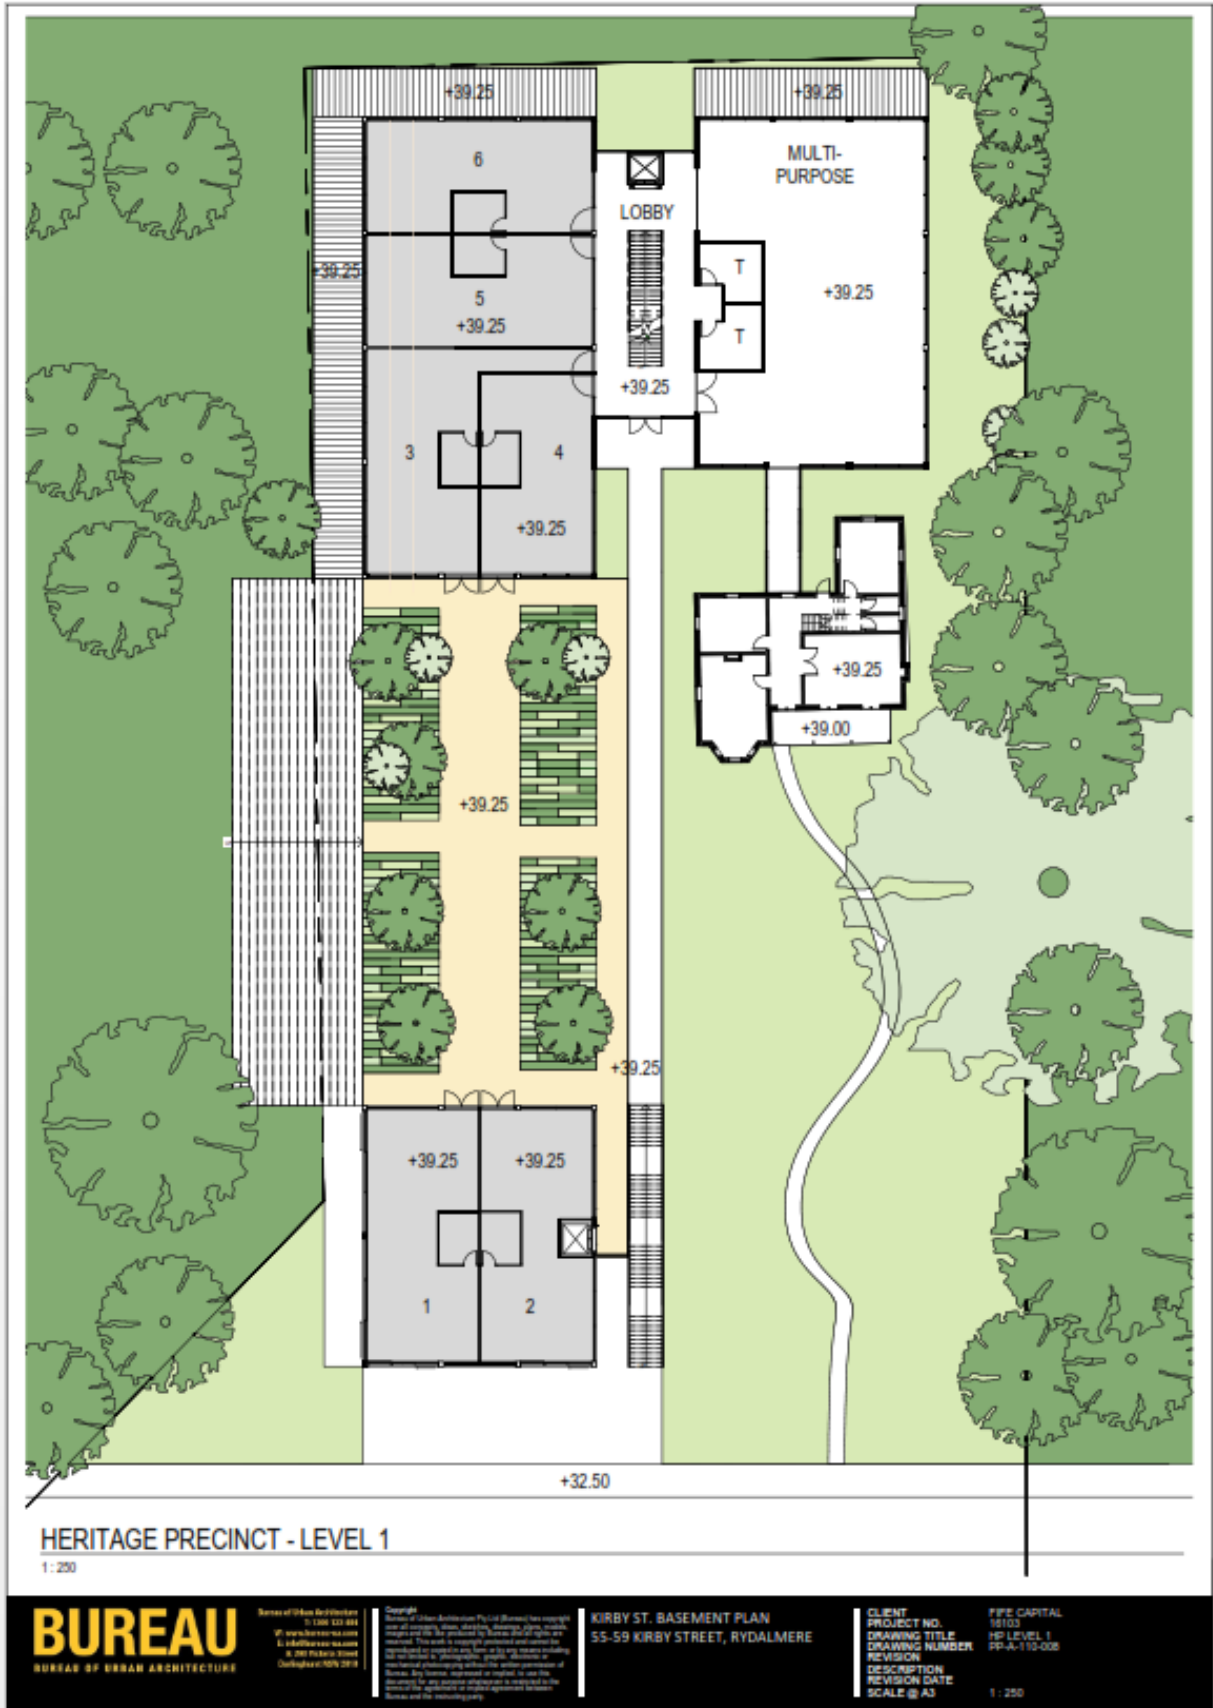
Upjohn House Heritage Precinct – Level 1 Floor Plan
